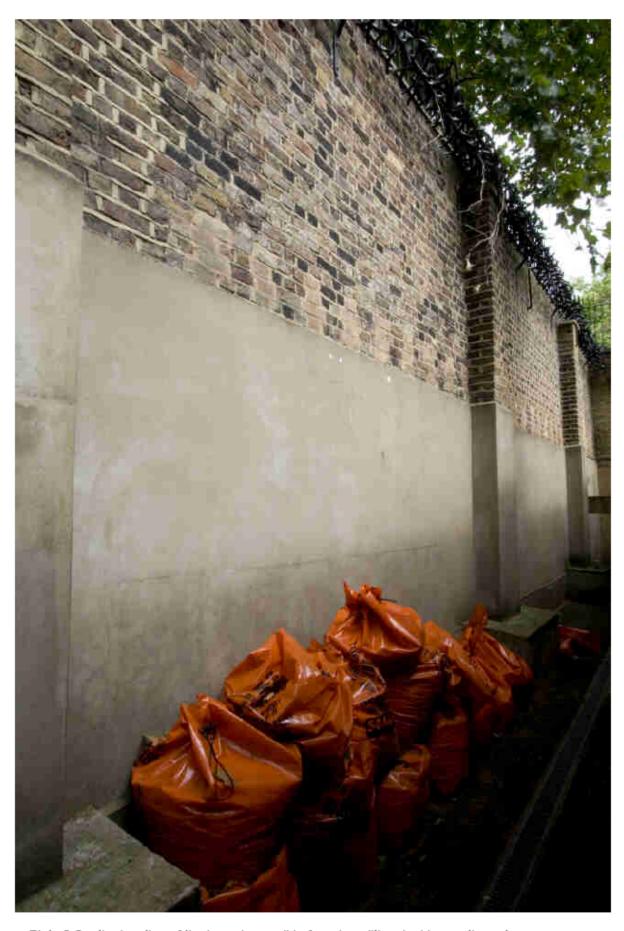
South elevation of the boundary wall before demolition, looking north-east
